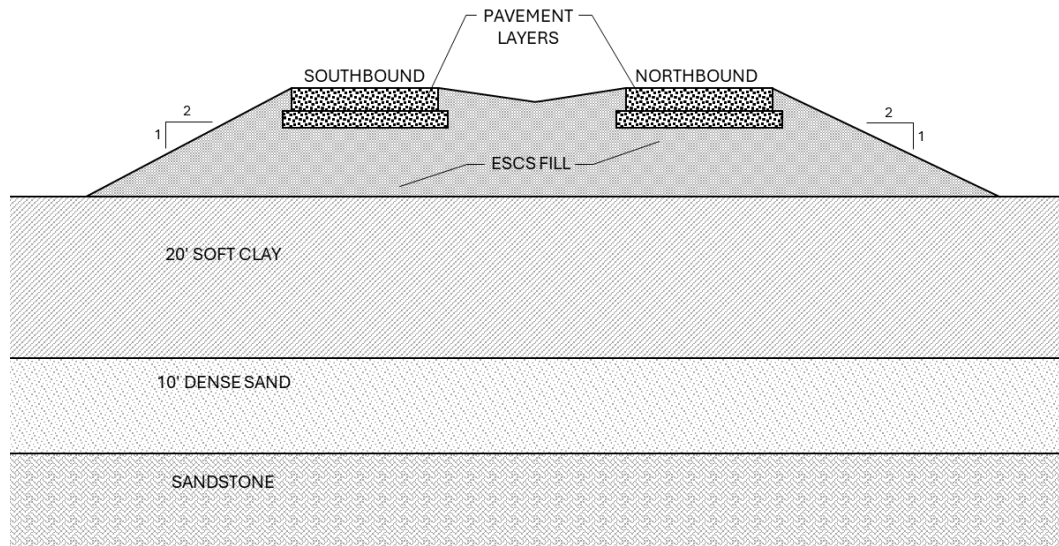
Typical cross-section of the embankment (redrawn from Saride et al. 2010).
